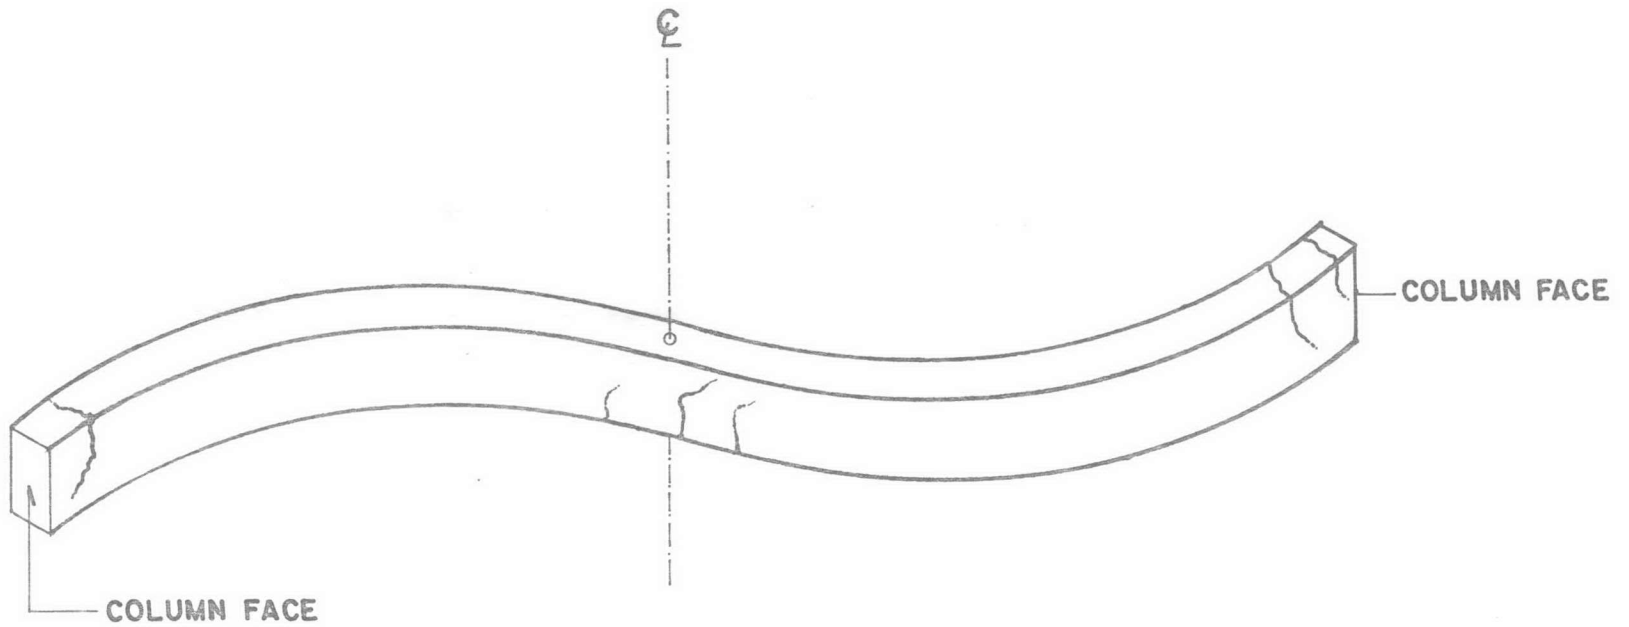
Sketch of Interesting Cracks on S-beam Model
